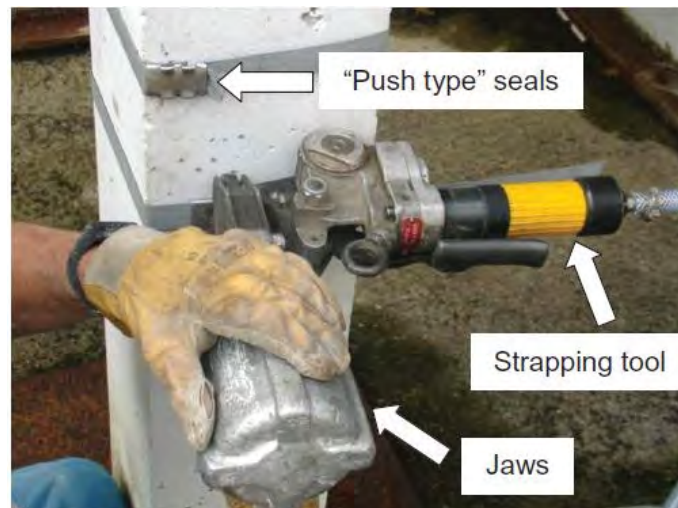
Metal straps fixed in the beam-column joint (adopted from Garcia et al. 2014)
